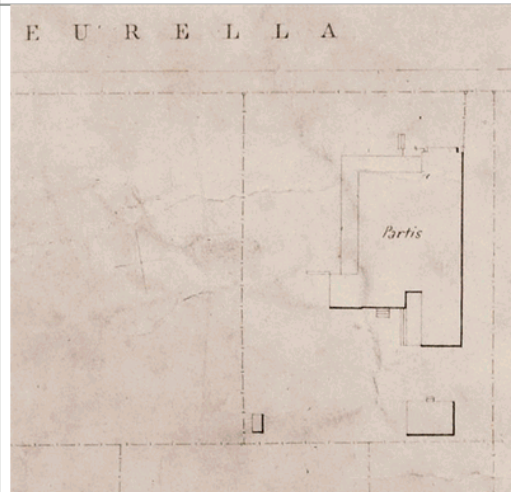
Circa 1894 "Block Survey Plan" showing the outline of the site and outbuildings, well, and the adjacent house.
